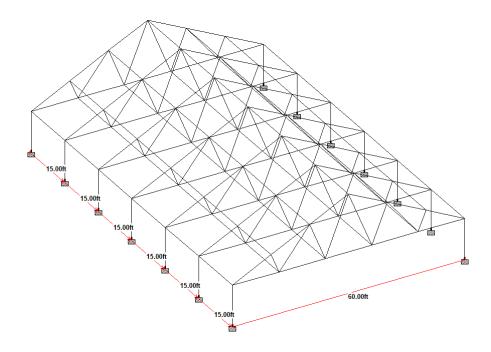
Three Dimensional View of the Roof Truss (Fink Type)
